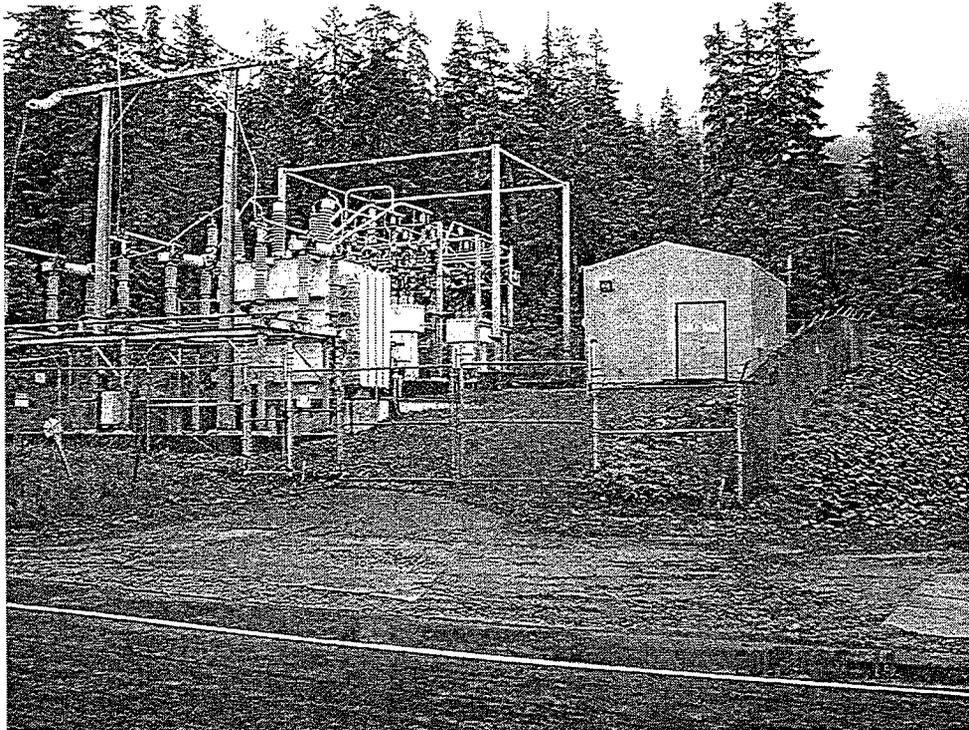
FOUR DAM POOL POWER AGENCY SUBSTATION
